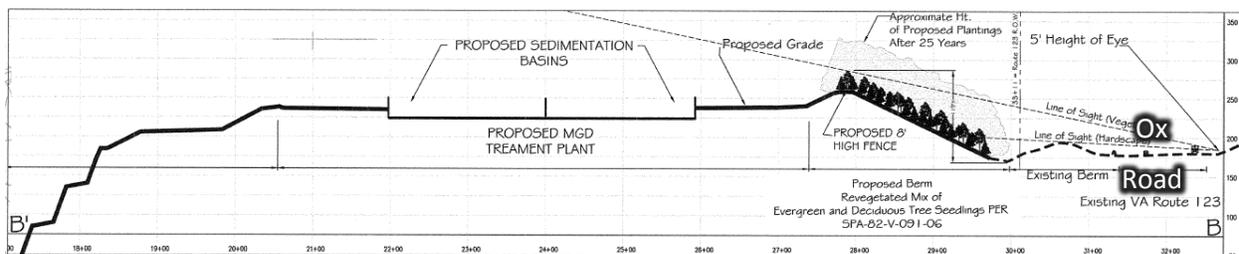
The berm along Ox Road shielding the treatment facilities to be constructed during Phase 3 would be 80 feet high when compared to Ox Road. This height would not include the proposed landscaping on top of the berm (Source: Dewberry Consultants, LLC., 11/4/2014)
